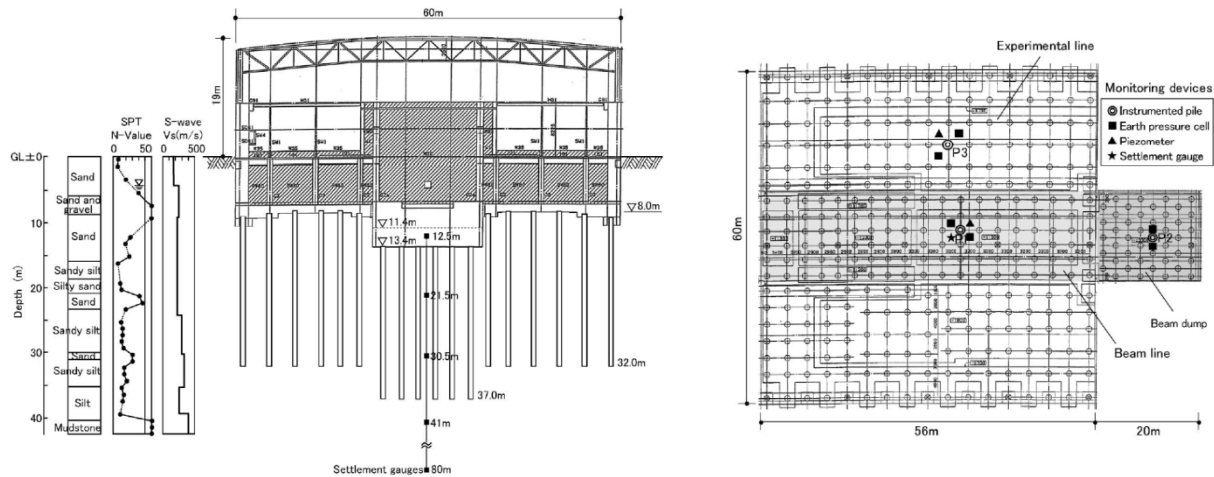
Soil profile, foundation plan and elevation of Haddon experimental hall, adapted from Yamashita et al. (2011)
